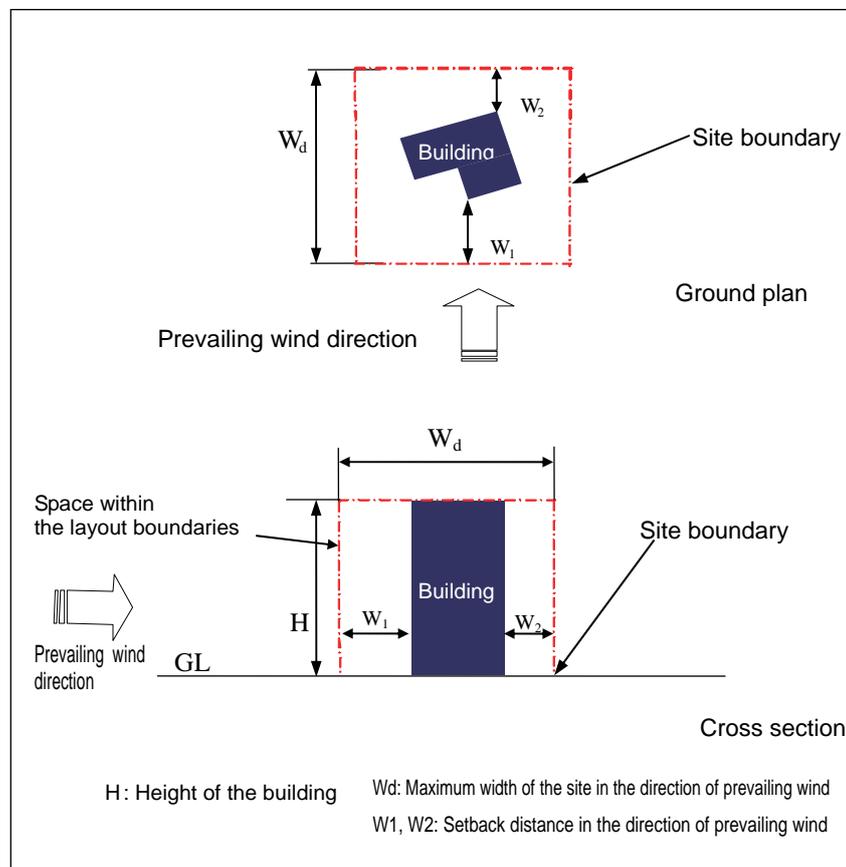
Setback distance from site boundary W_1/W_2 and building height H
